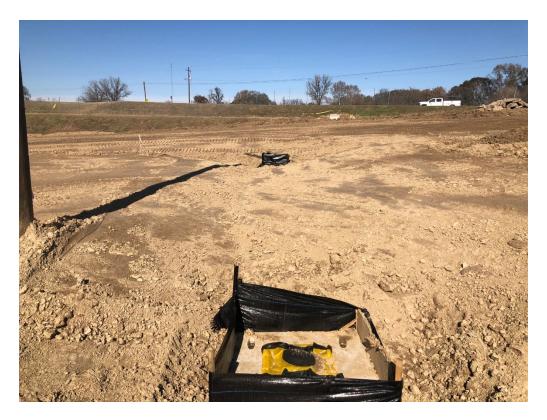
Storm Sewer Connected (Inlet #8 Looking North)
